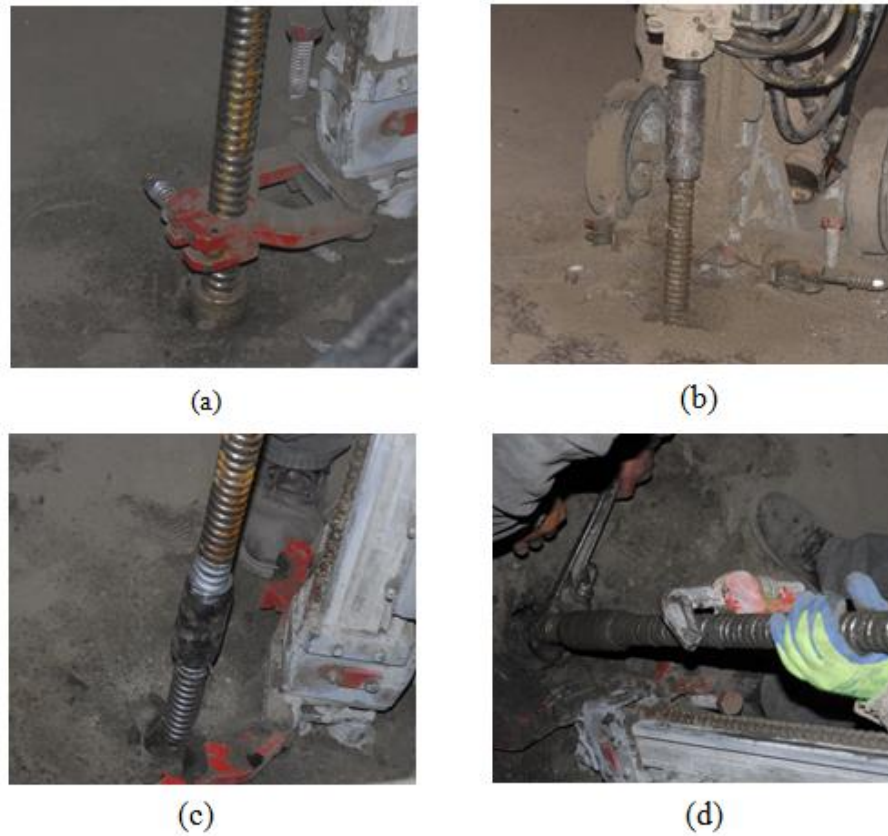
shows detailed information of the setup process of the drilling machine. The drilling process started with the boreholes on the left side of the test zone, closer to the main adit. When the drill was in place for each hole, a rod (which had been welded to the top of the drill) was wedged against the tunnel ceiling to prevent the drilling machine from shaking back and forth or moving vertically. At the bottom of the drill were two leveling screws, used to plumb the drill. Three lines were connected to the drill head: two were hydraulic lines that provided drilling power, and one was a compressed air line for keeping the hole clear.
